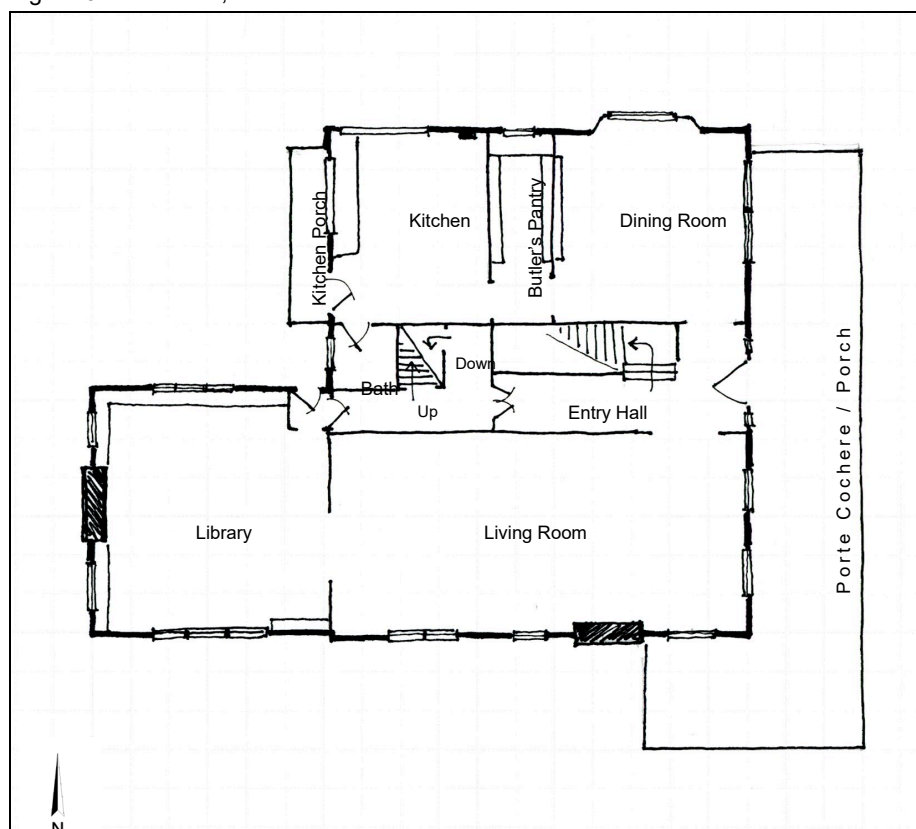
Floor Plan, 1<sup>ST</sup> Floor.
